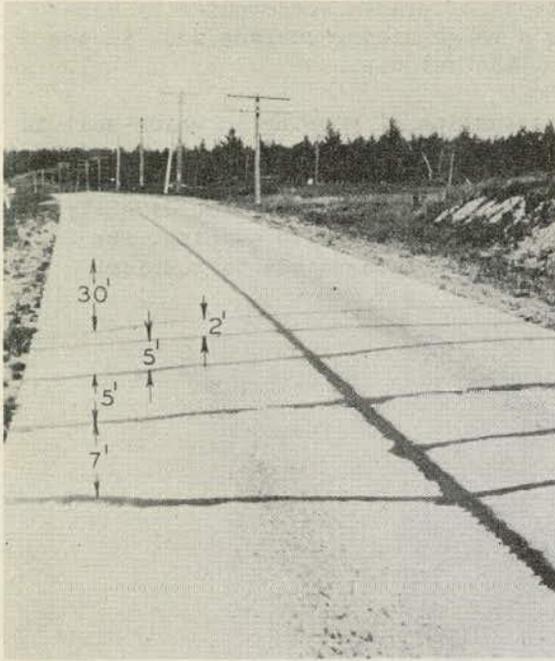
Cracking in concrete pavement due to frost heave. After Aaron, 1934-3. (Photo courtesy of Bureau of Public Roads)
